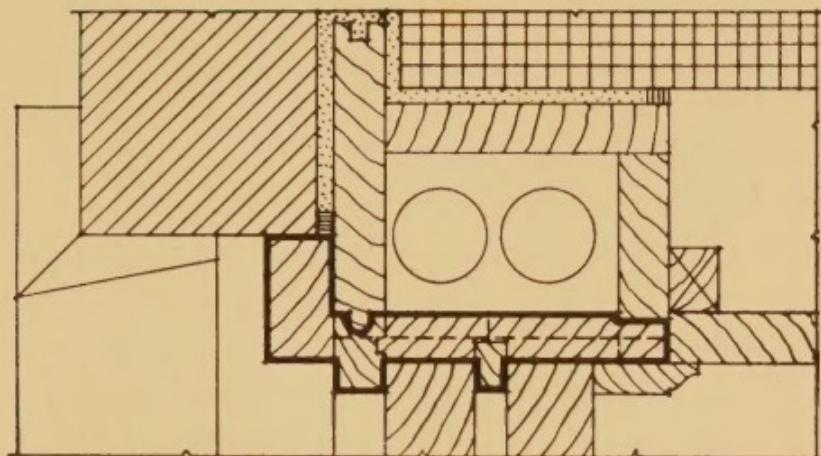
Frame No. 101 or 102 converted to a box frame for standard eight inch tile wall with suggestion for attaching jamb liner for 13 inch wall. Standard 6 inch D & M used for blind stop and standard inch lumber to complete the box.
